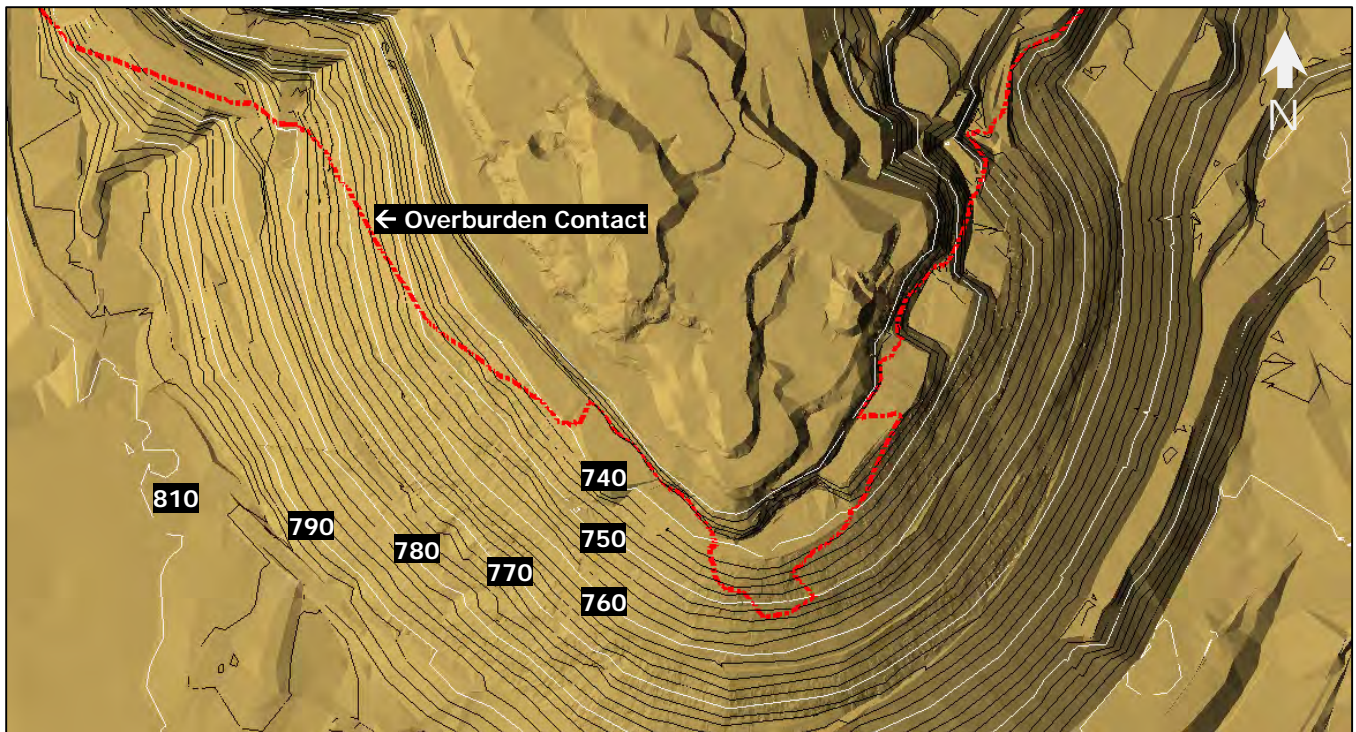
Overburden contact (red) where it intersects the final pre-failure as-built of the south wall.
